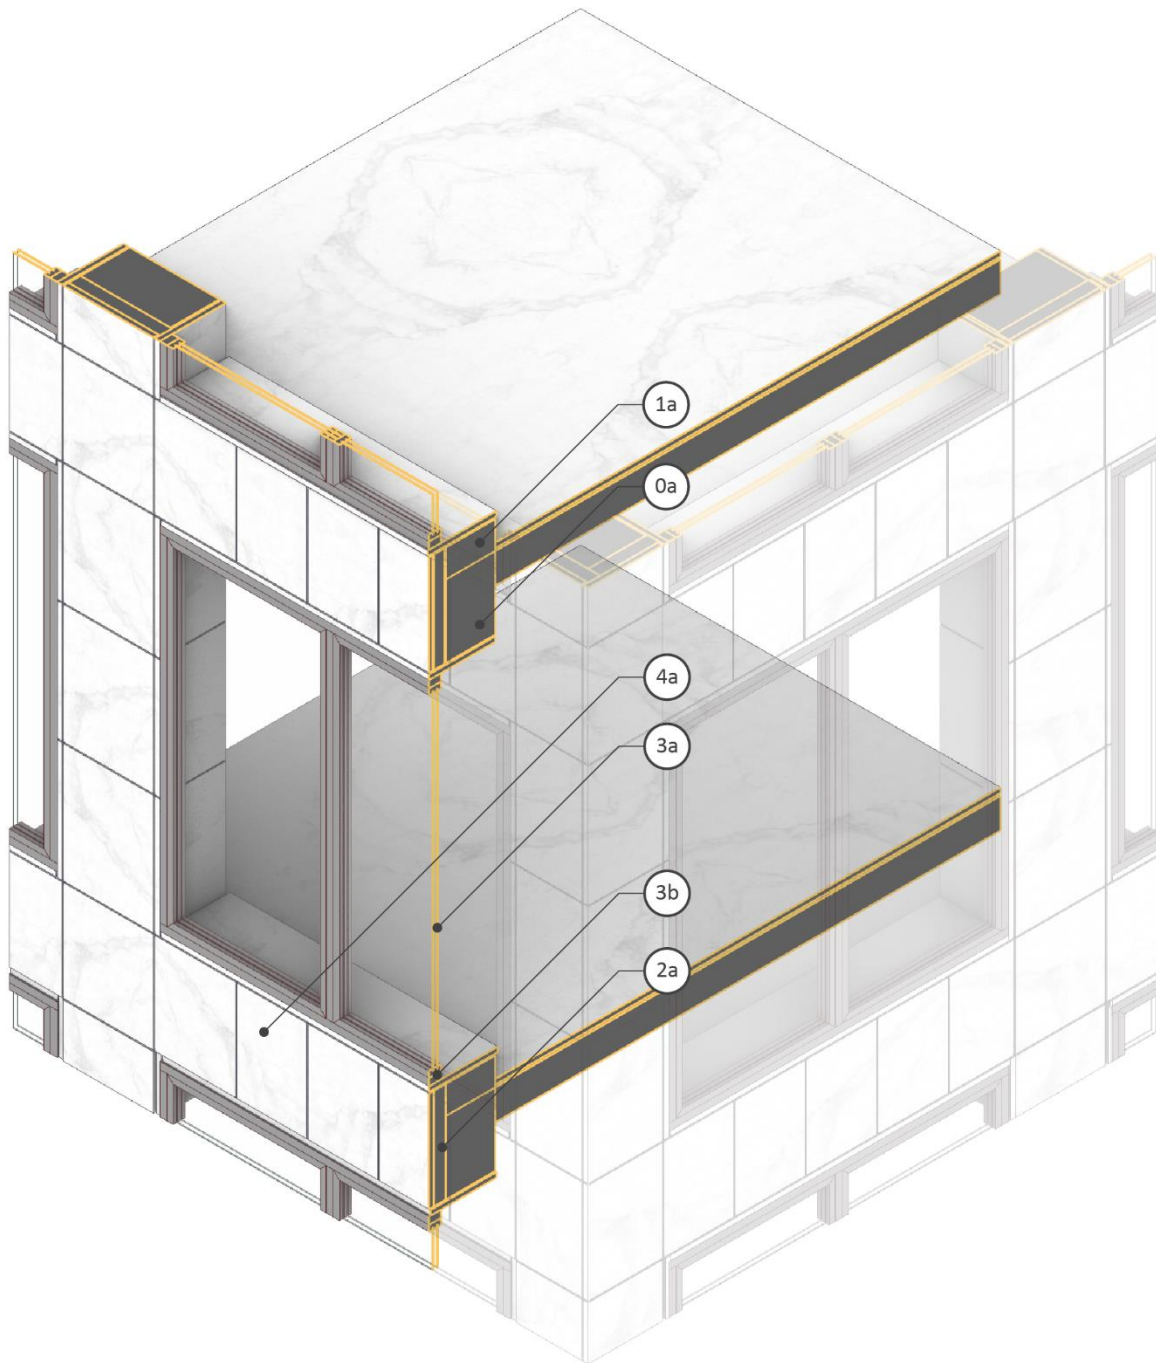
Chosen corner detail of a typical office building envelope with existing materials
